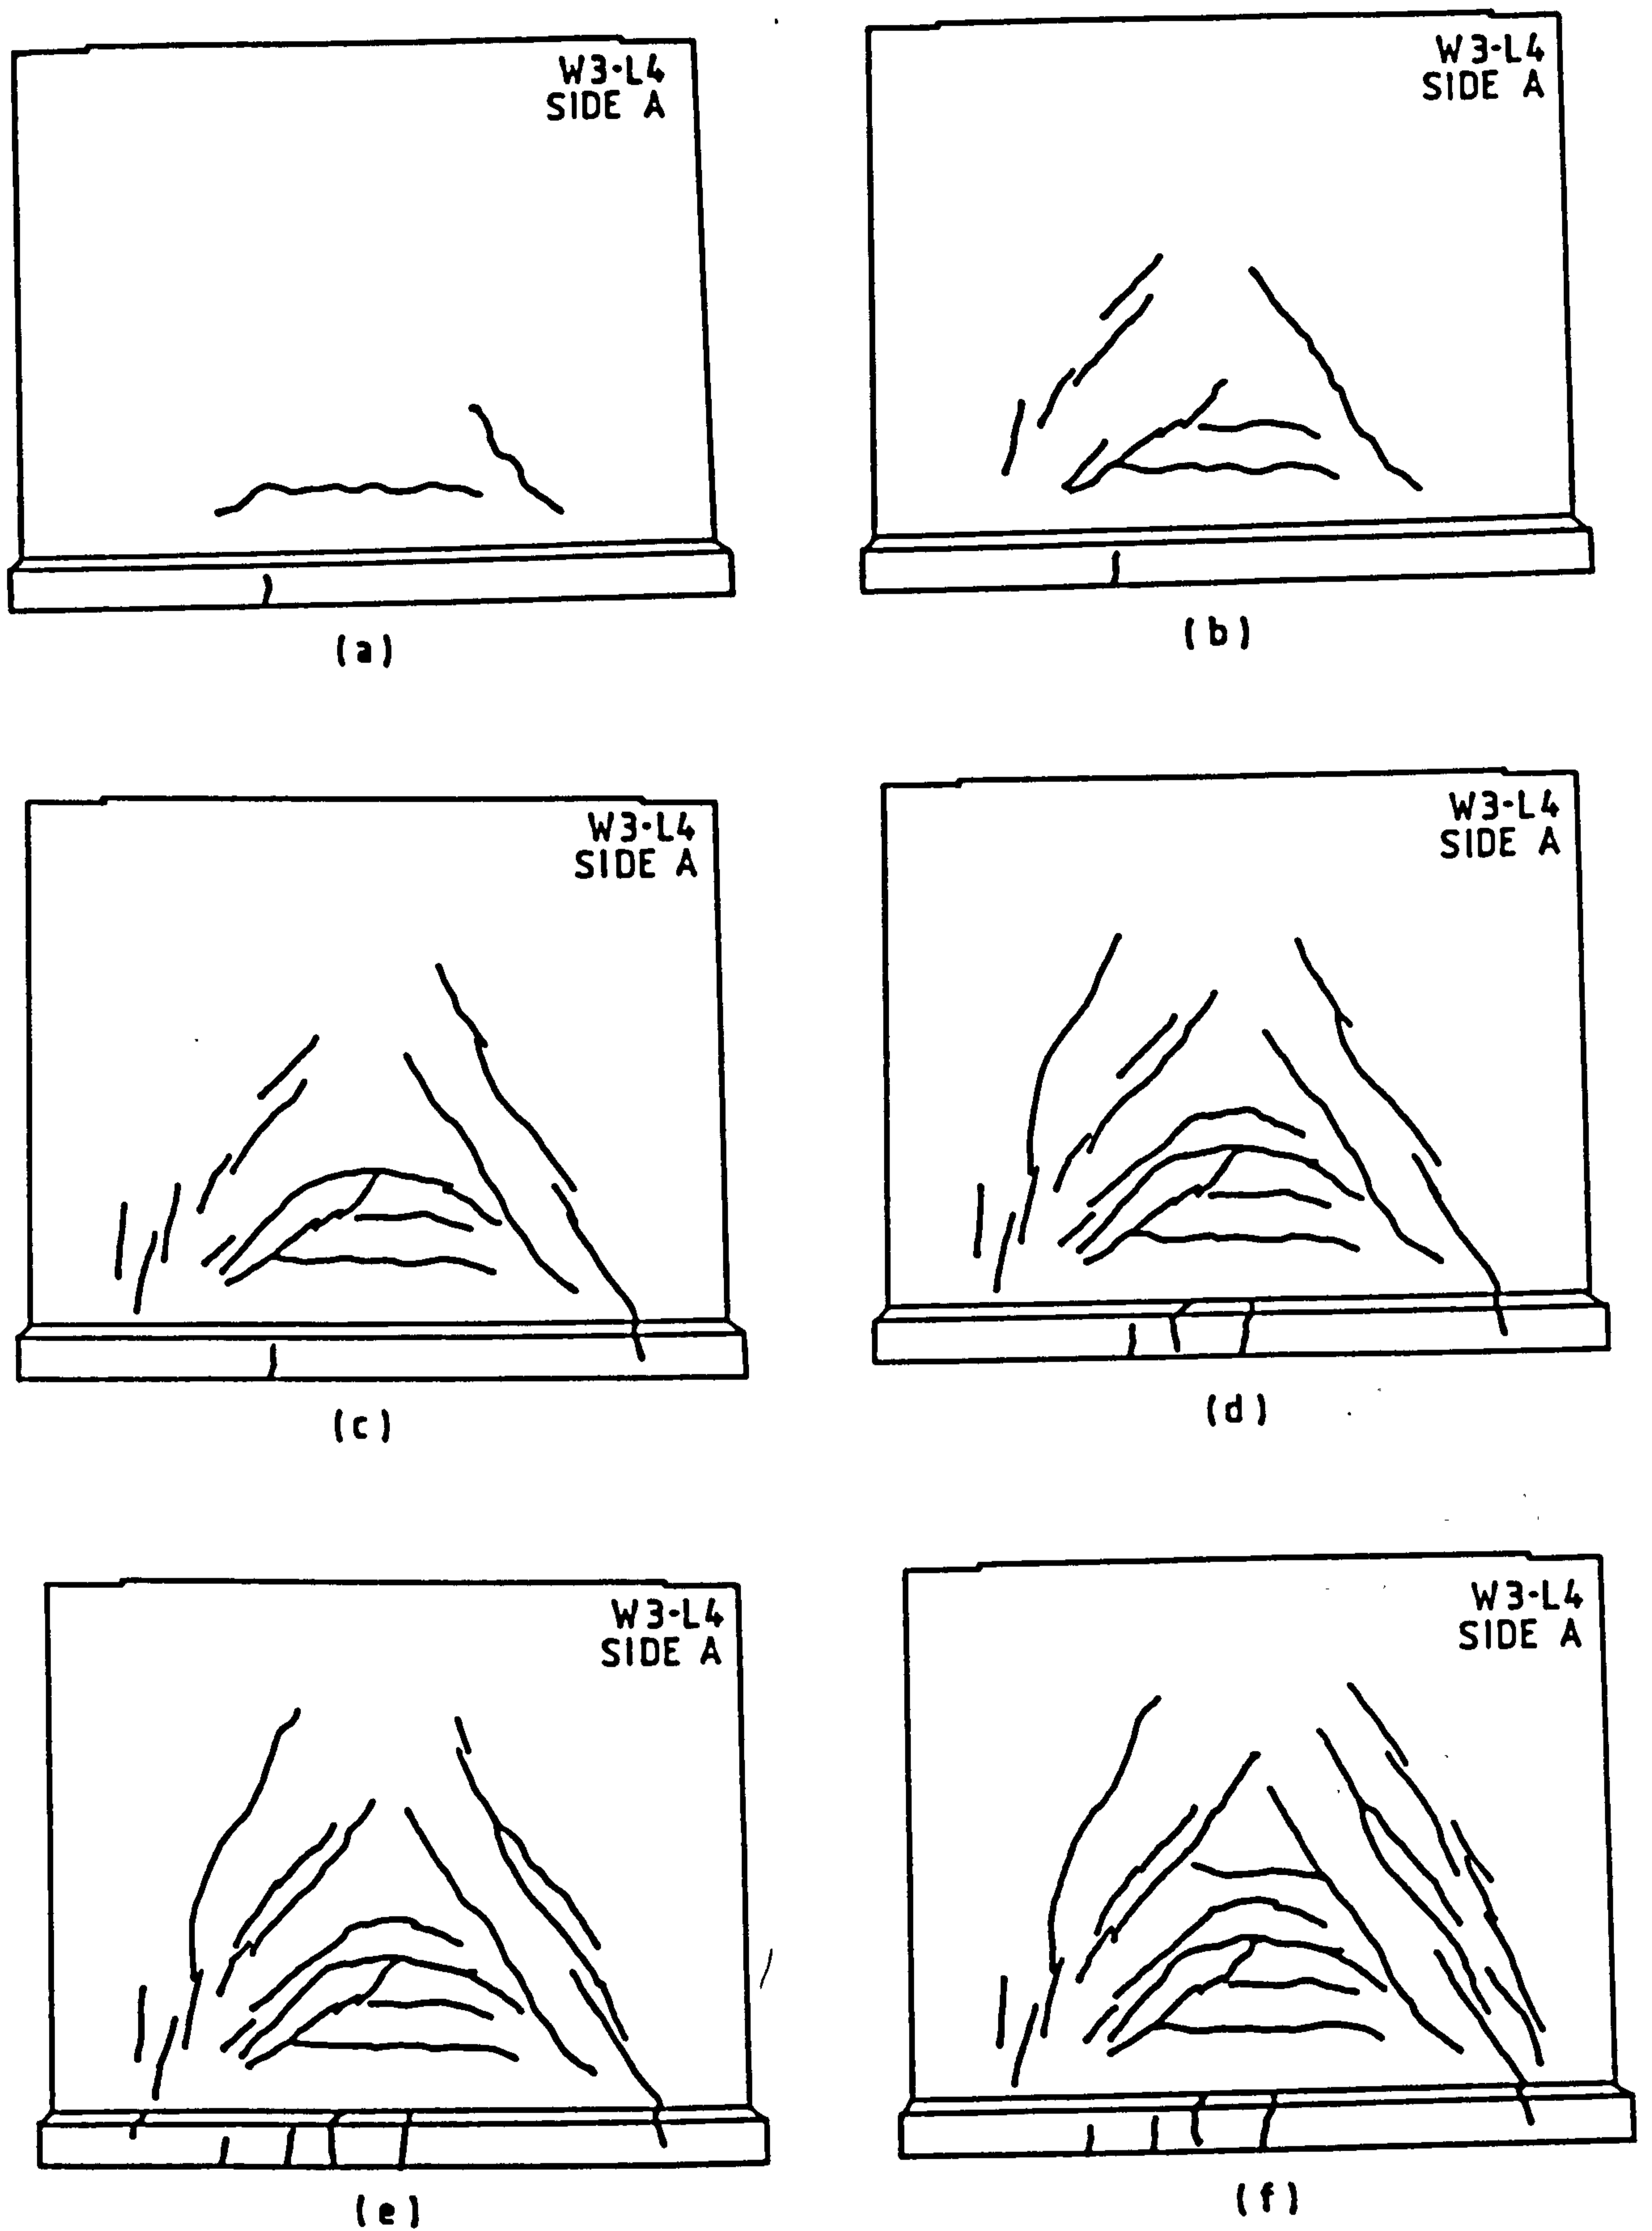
Development of cracks in wall W3-L4
